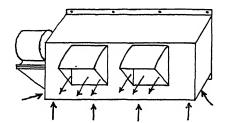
Large Industrial Type Fan Unit Electric Heater
